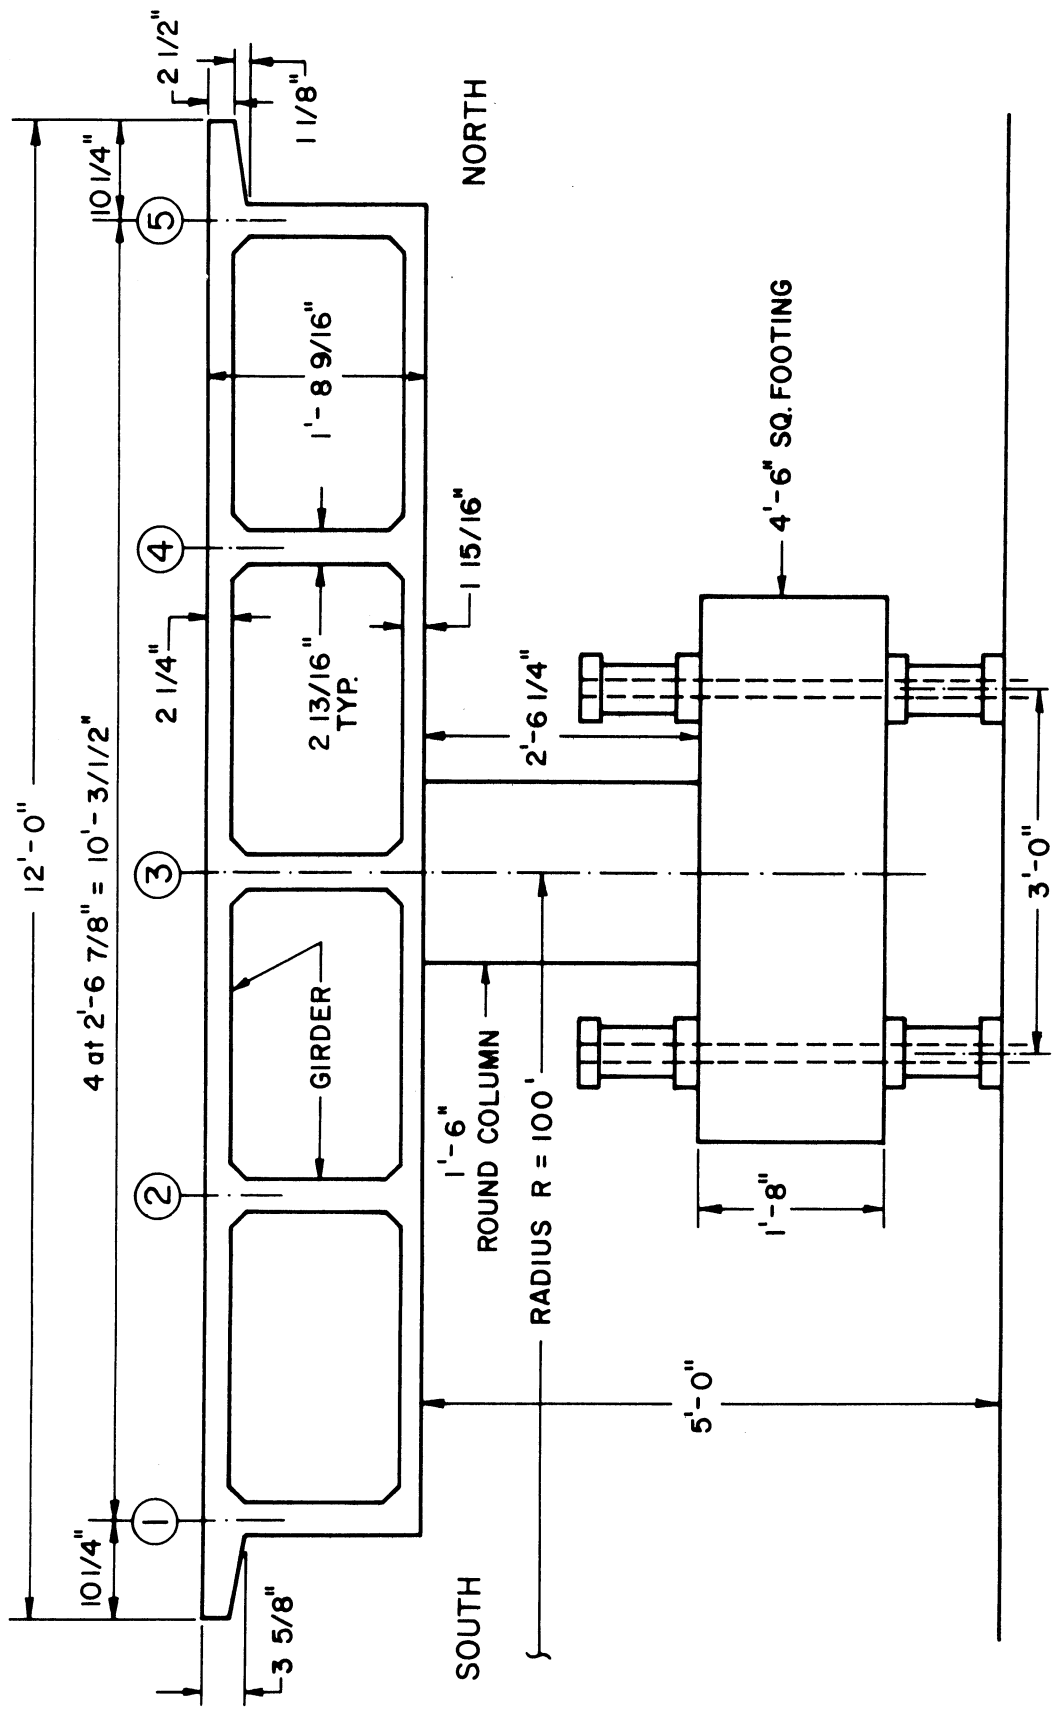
TYPICAL SECTION OF BOX GIRDER BRIDGE MODEL
